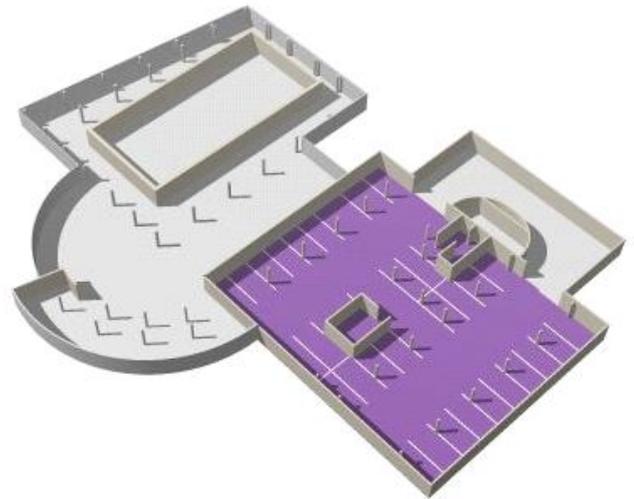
1st example - 3D view of the underground level of the sport center with parking lot.
